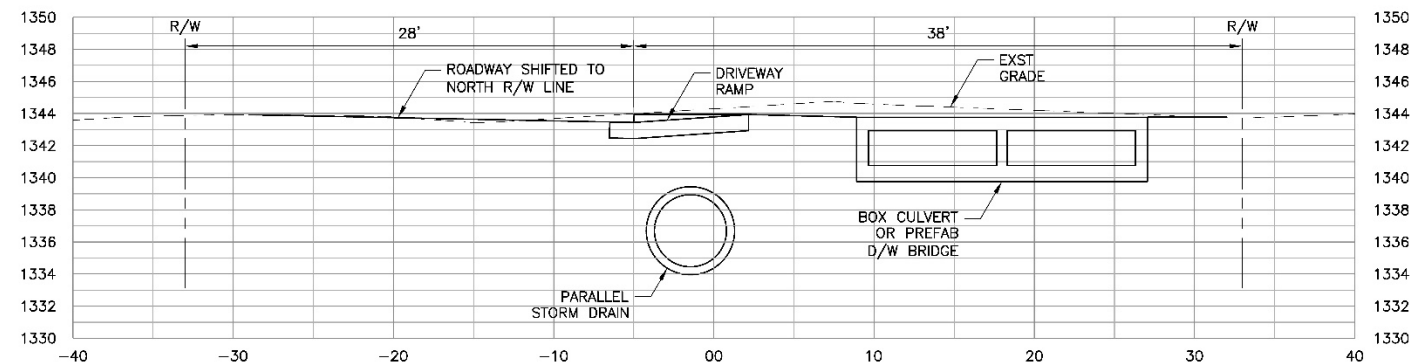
Cheney Channel Typical Driveway Culvert (Facing East)
